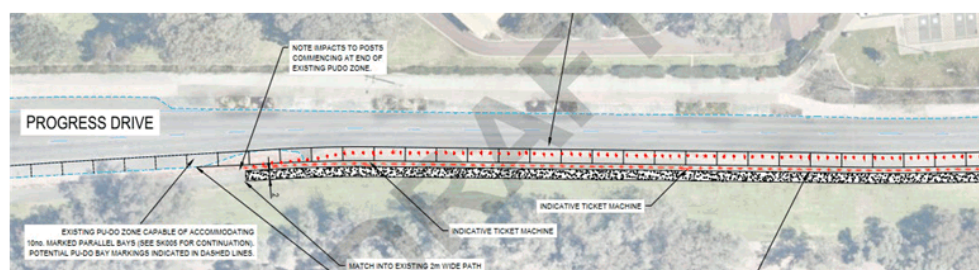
Typical parking embayments / parking lane (southern extent)
